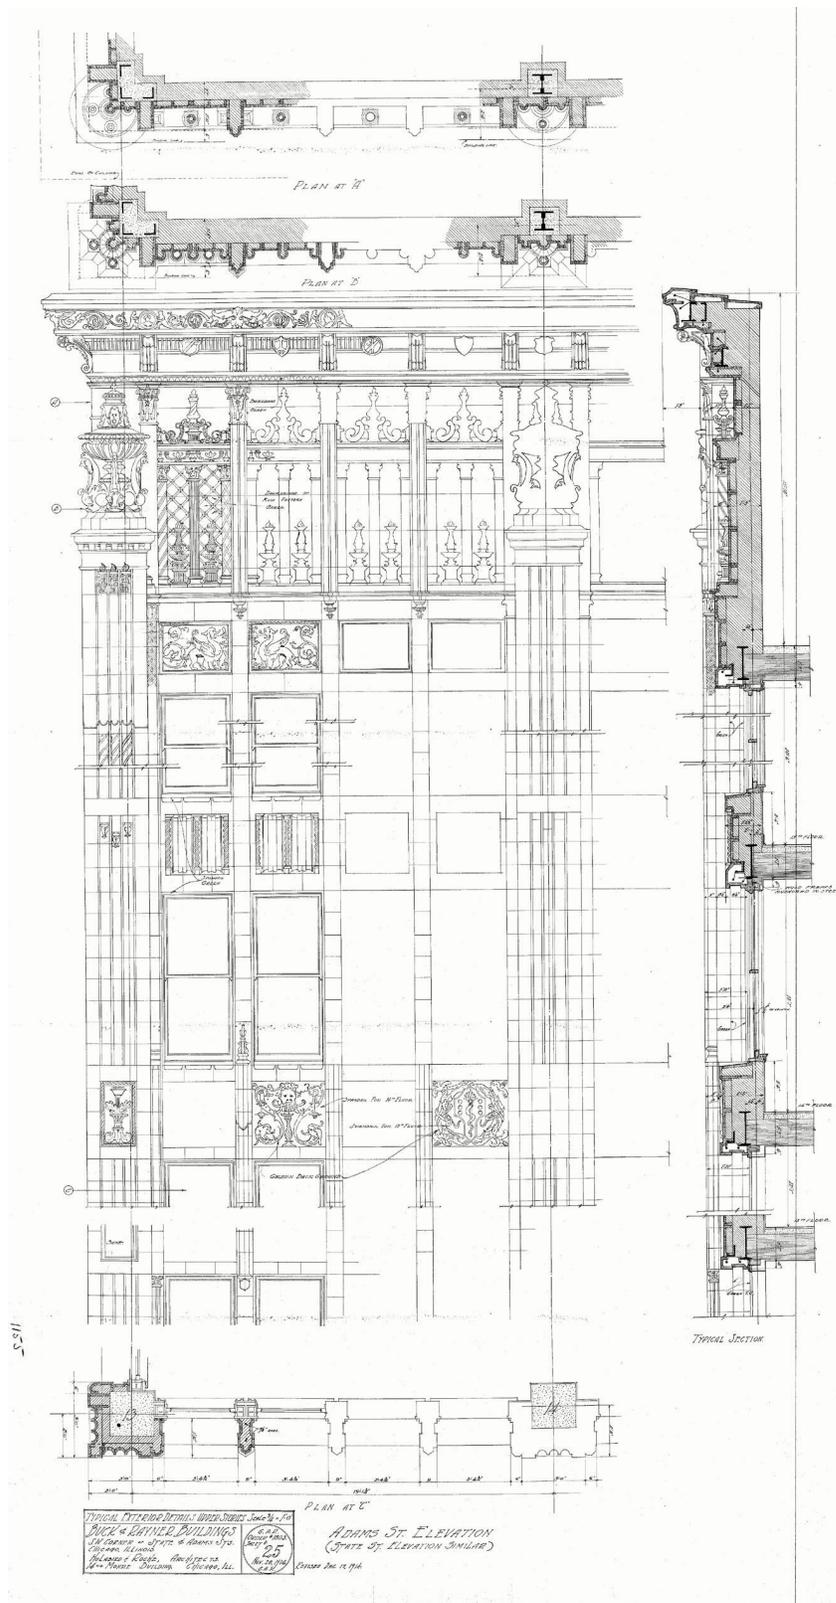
Original drawing, 202 S. State, north façade details, upper stories.
